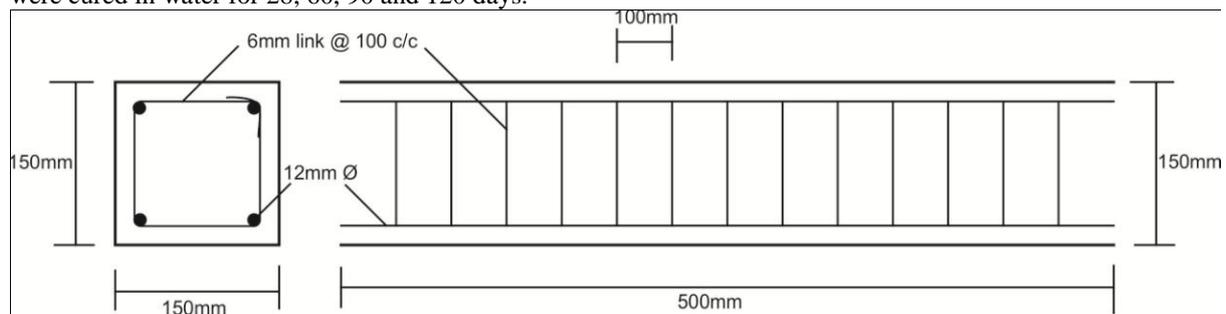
Cross and longitudinal section of reinforcement used for beam specimen
